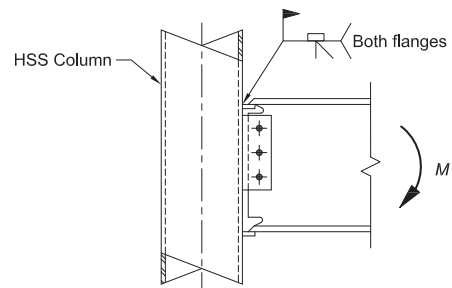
Directly welded moment connection for Example 6.3
